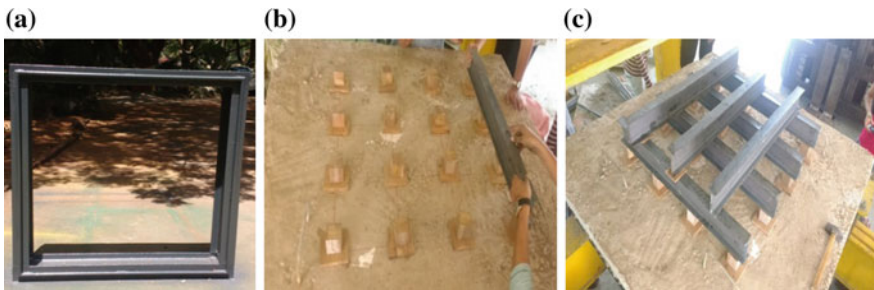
a Roller support frame. b Arrangement of wooden block on sixteen points. c Loading arrangement of I sections
